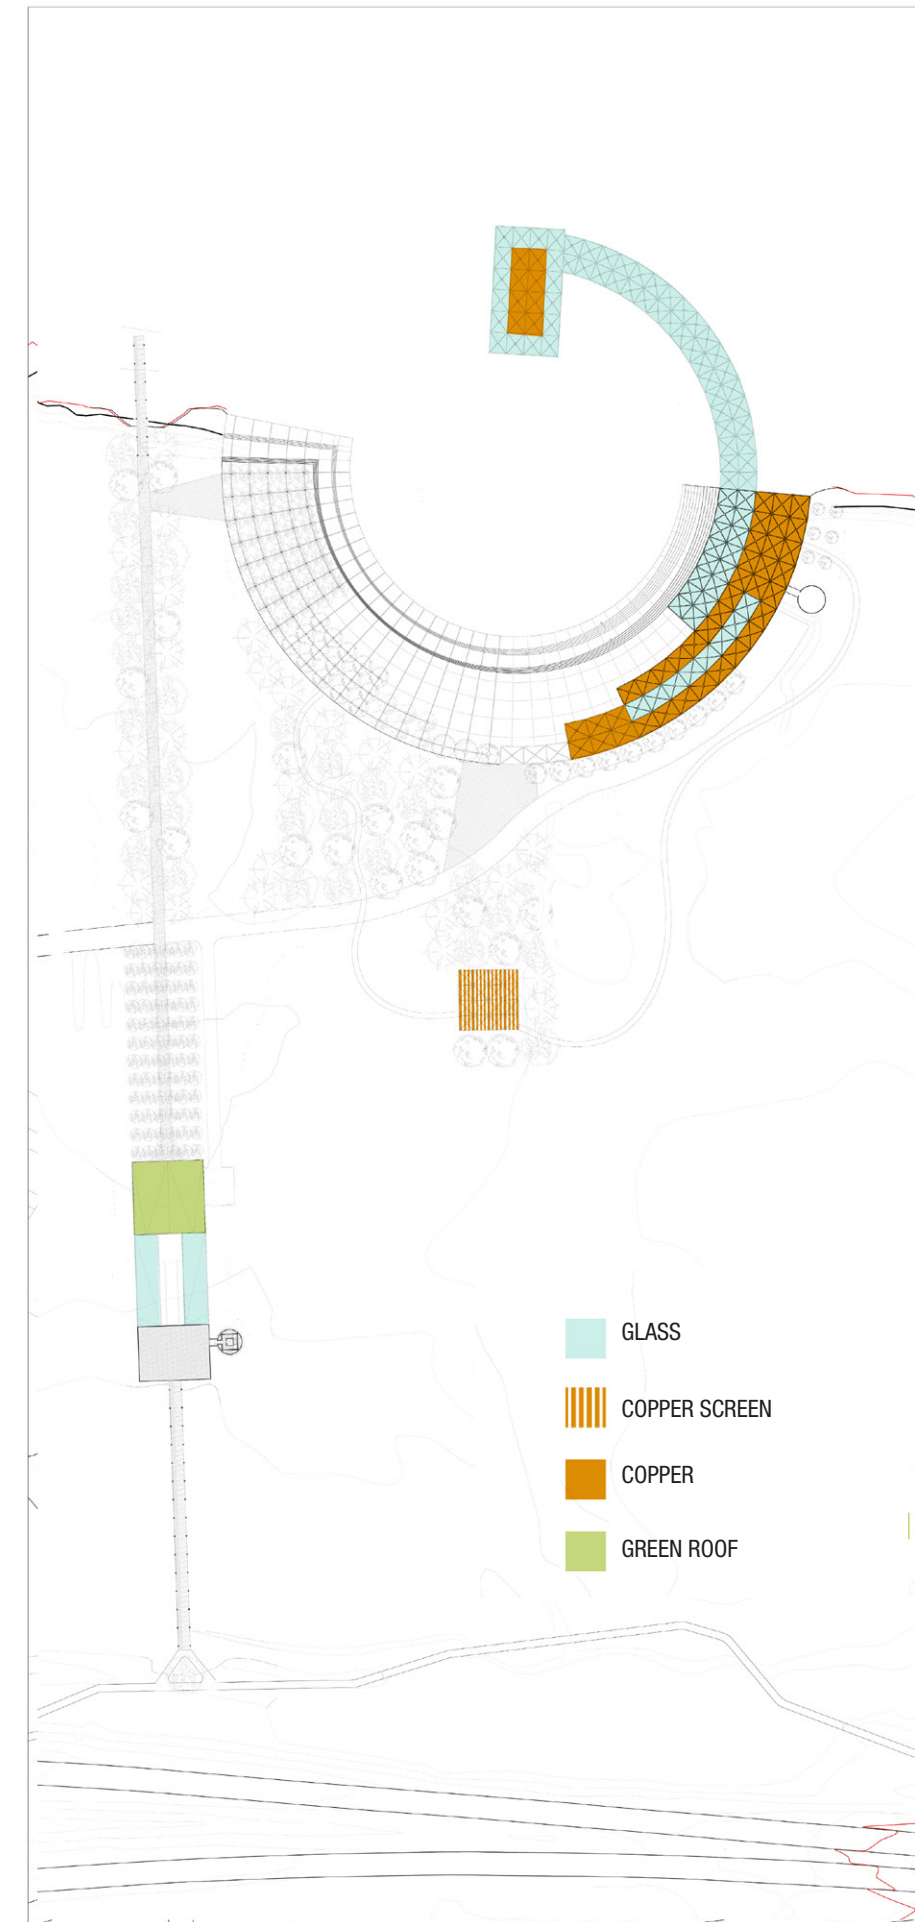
Site Plan showing the different kinds of roof coverings in the design
